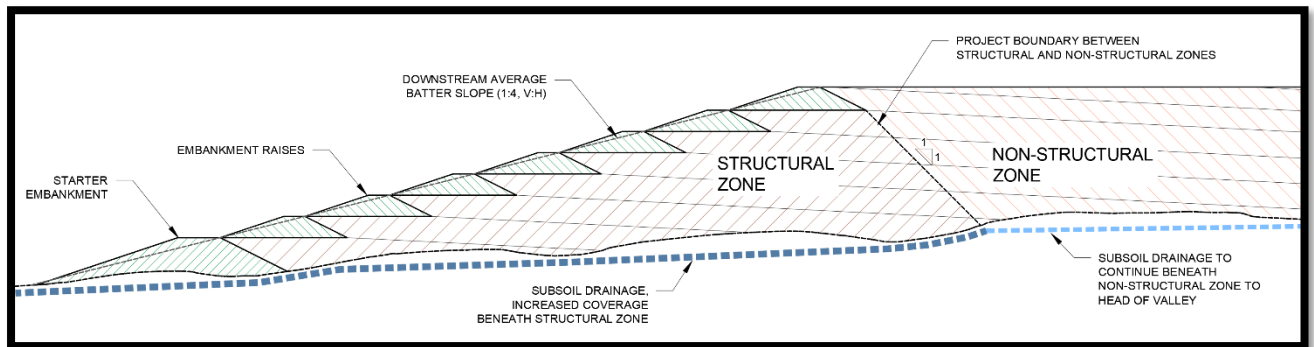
Section of Dewatered Tailings Storage Facility Construction
